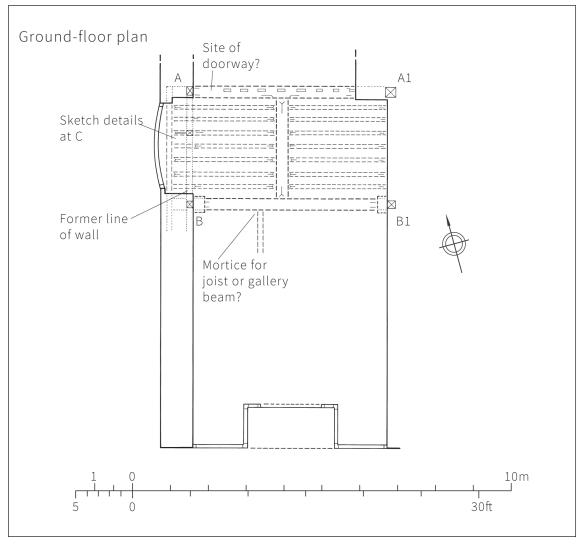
33 High Street, ground-floor plan (Drawing Allan Adams © Historic England).
